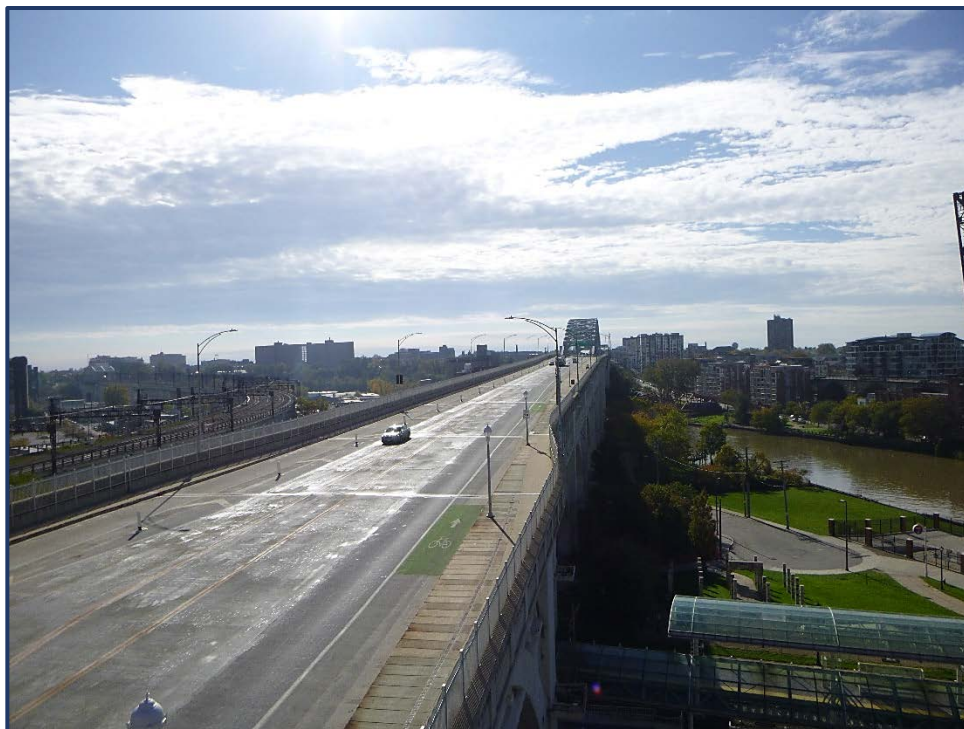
Upper and Lower Deck Nomenclature, Concrete Arch Spans
